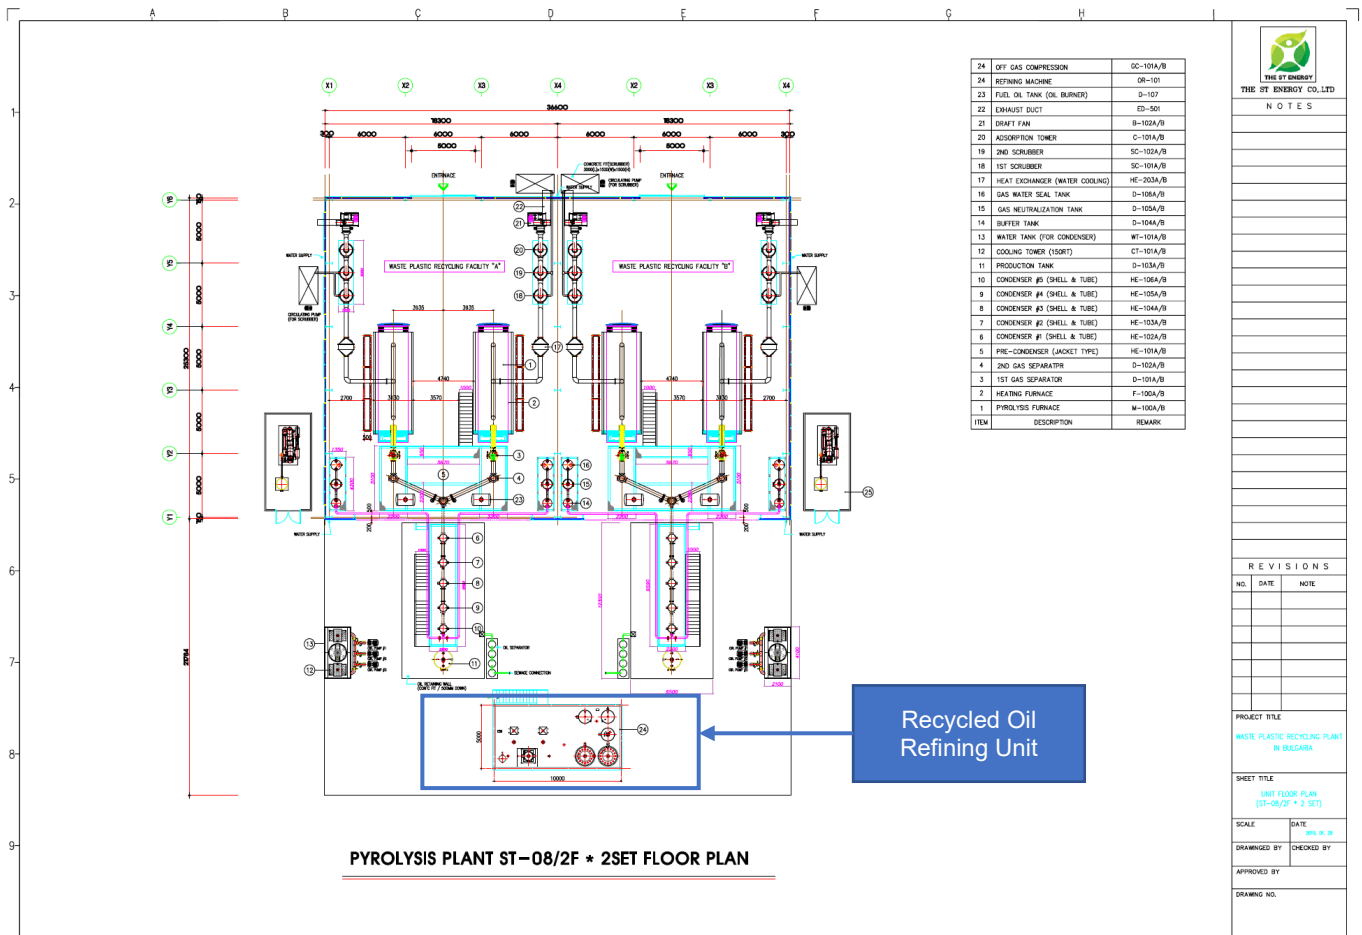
Floor Plan of ST-08/2F Model (2 units) as a Module
